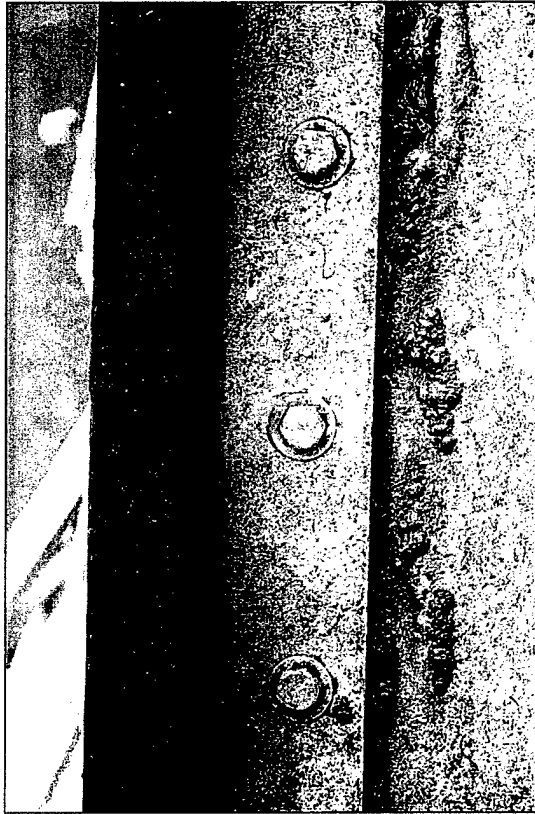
Side seal from upstream side with no signs of cracking or deterioration, typical condition.
